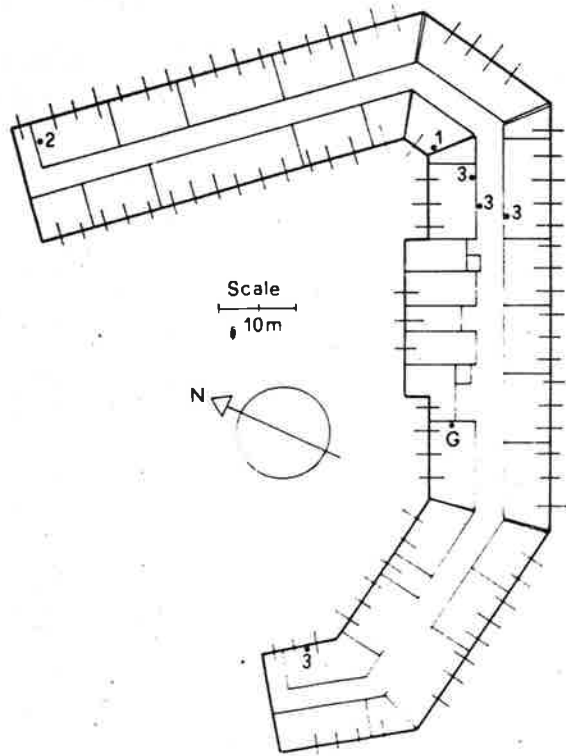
Plan of the building: the positions of the temperature sensors are shown (G = ground floor).
